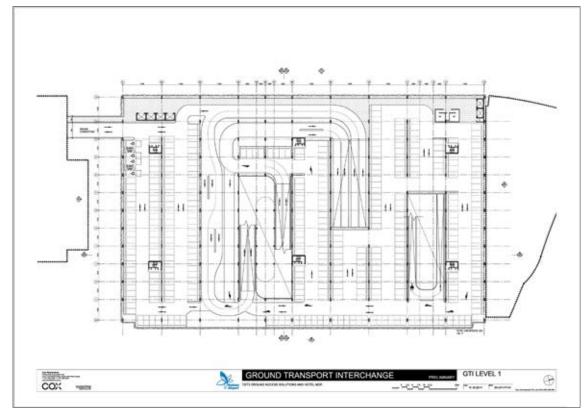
Ground Transport Interchange – indicative typical floor layout
